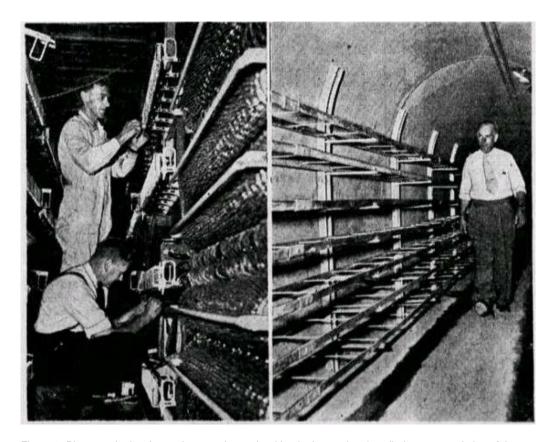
Photograph showing underground tunnels with telephone wires installed upon completion of the Exchange building's construction. (Source: Age 31 March 1954:5)
